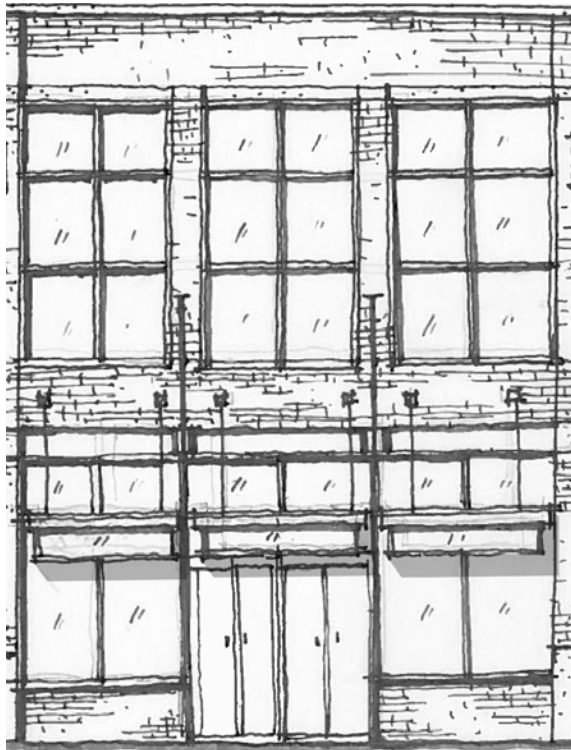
Centre Street - Corner Articulation Illustrative Example
